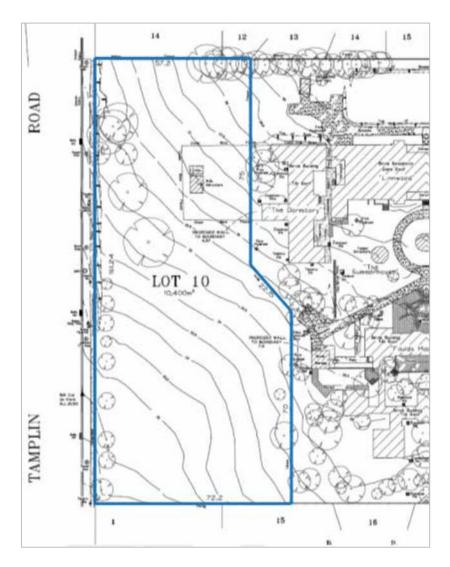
Lot 10, the proposed subdivided lot, outlined in blue
